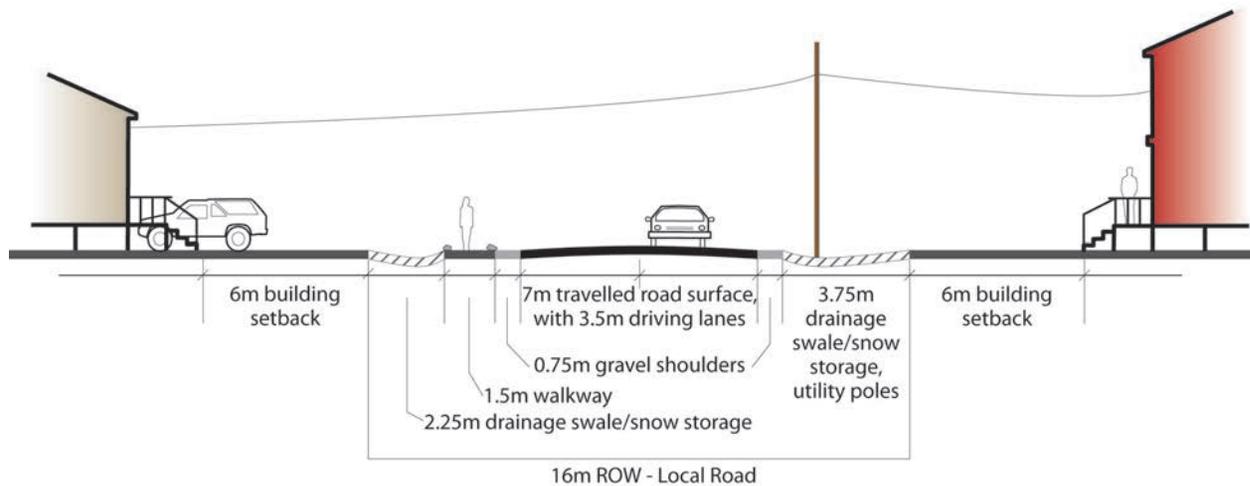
Local road (two-way) rights of way on trucked service should be at least 16 metres wide to accommodate road lanes, shoulders drainage ditches and utility poles
